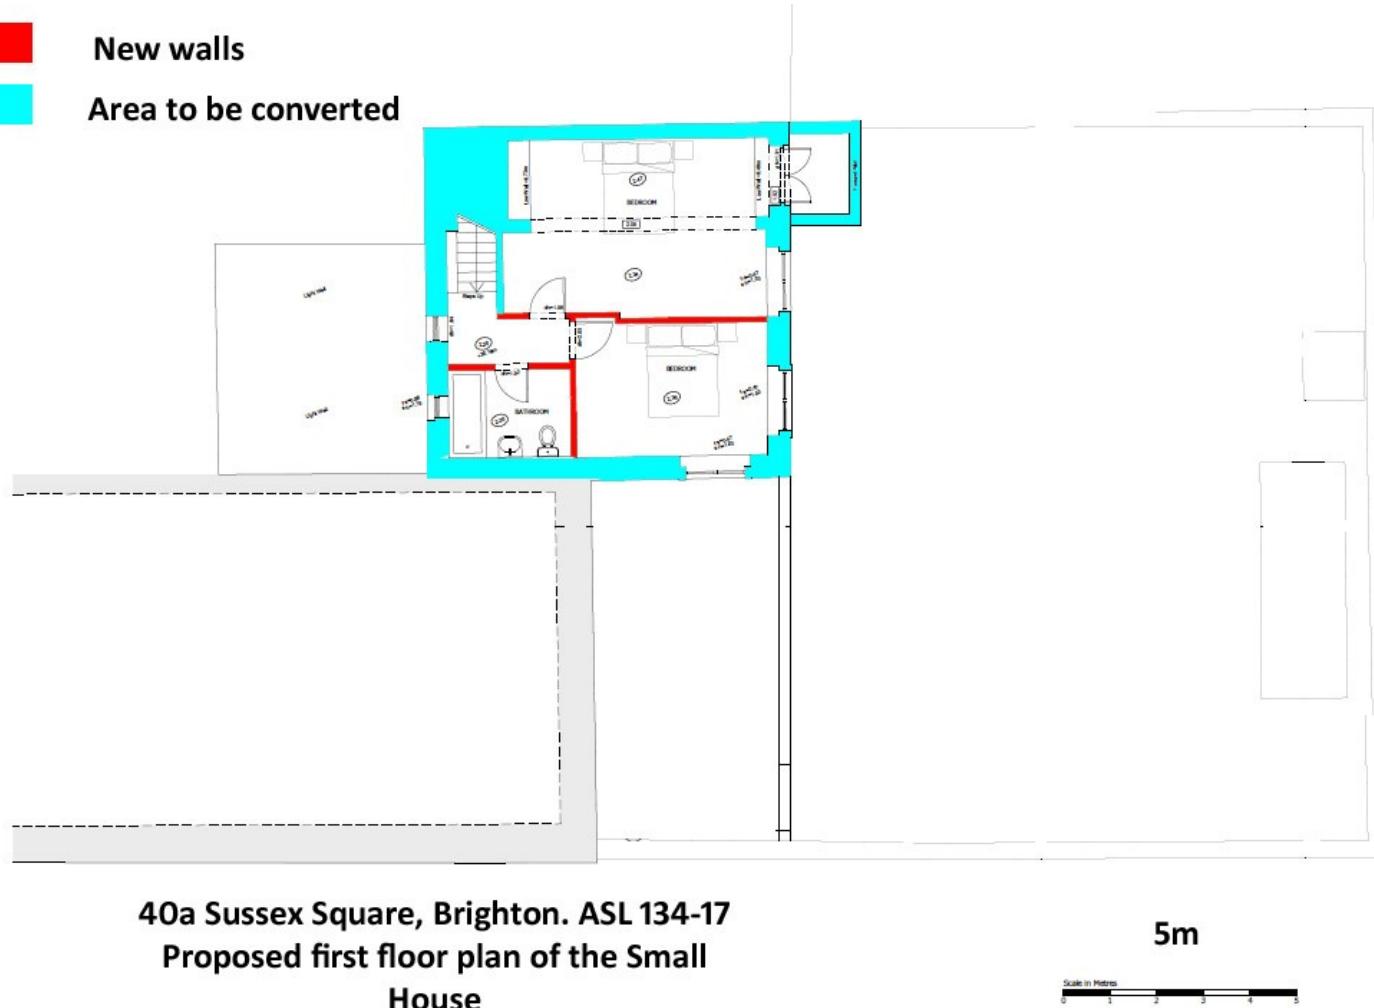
Proposed first-floor plan (adapted from Savills drawing number: 1054512/122 Revision, B. ©2015).
